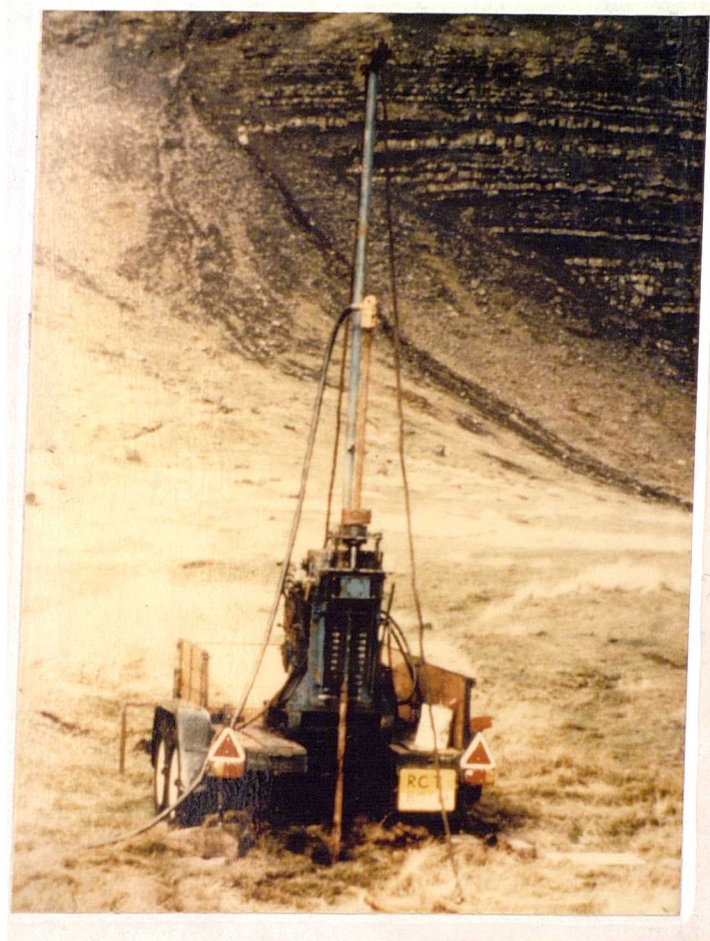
The drilling machine used for drilling Boreholes at Mam Tor.
